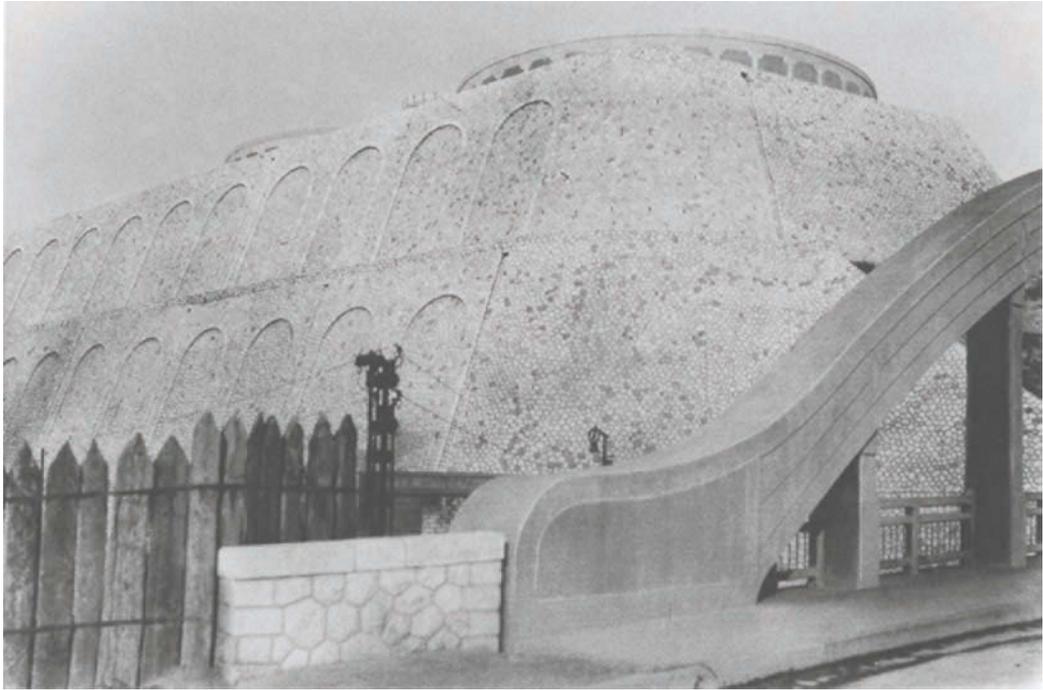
PETROLEUM TANK, CONCRETE BRIDGE, STREET, TRESTLE (MARSEILLES)
